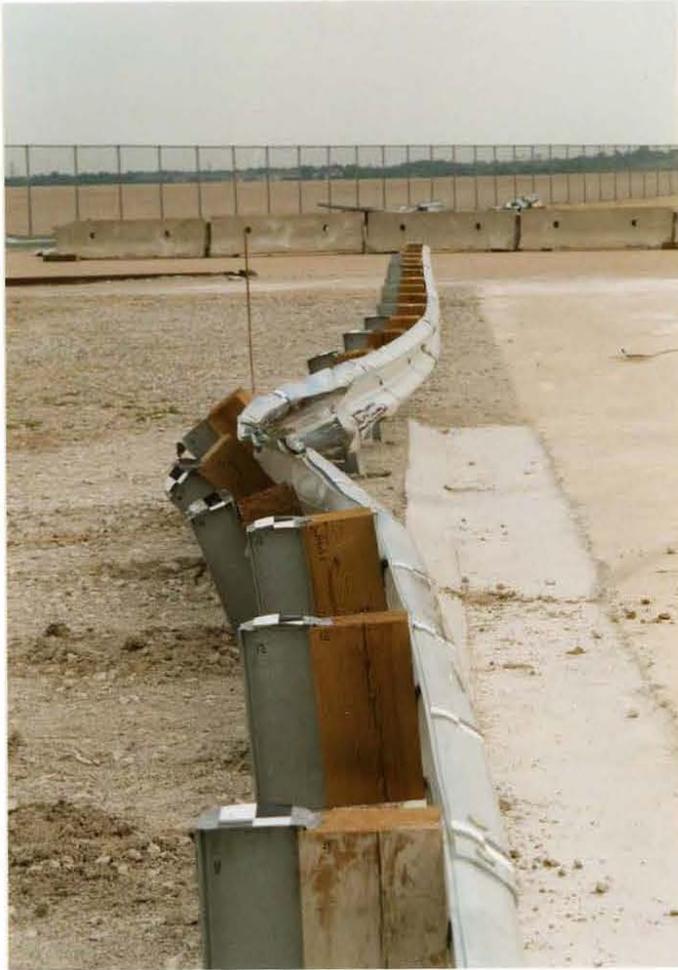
Guardrail Over Curb System Damage, Test NEC-2
